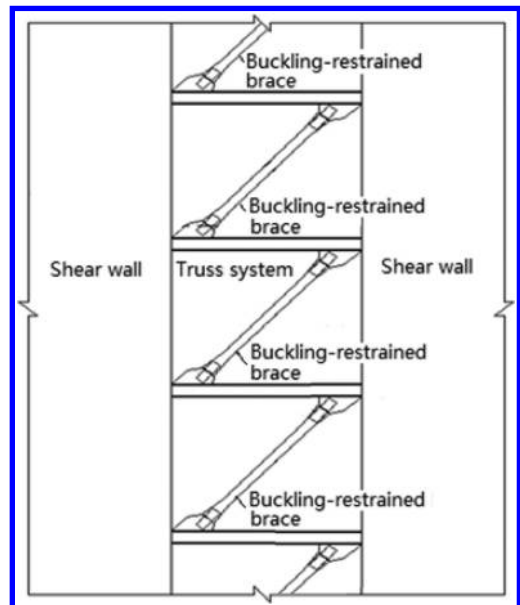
Schematic diagram of shear wall-steel truss structure system.
